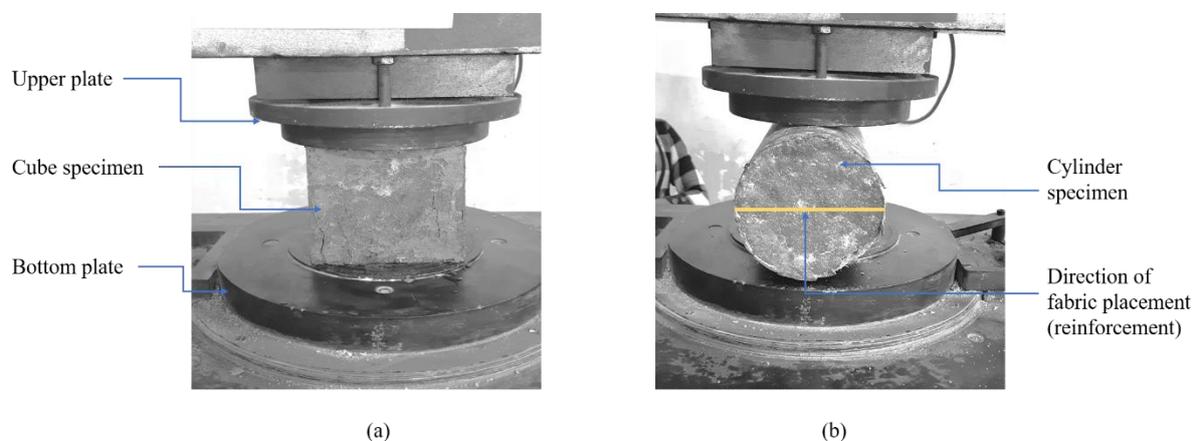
Test specimen configuration for (a) compression test of cube specimens, (b) split tensile test of cylinder specimens (UTM, used for specimen testing, available in the Department of Applied Mechanics, FTE).
